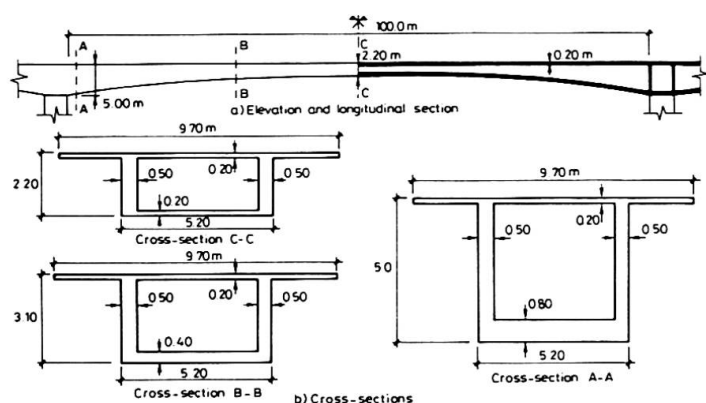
Elevation and longitudinal section of the bridge. Cross-sections.
